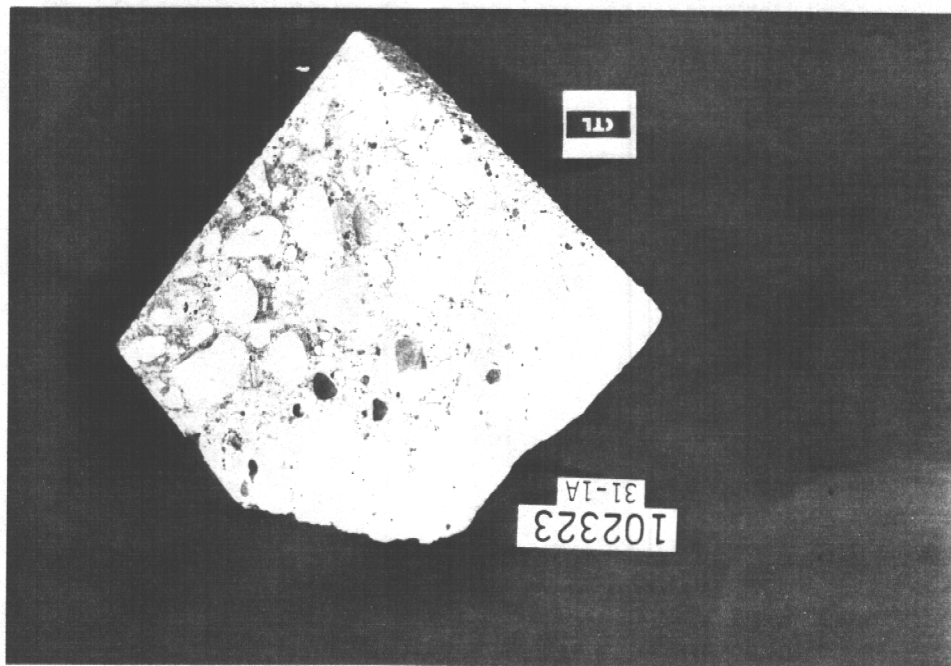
LAPPED SLICE SIDE OF CONCRETE SPECIMEN NO. 21-1A.
